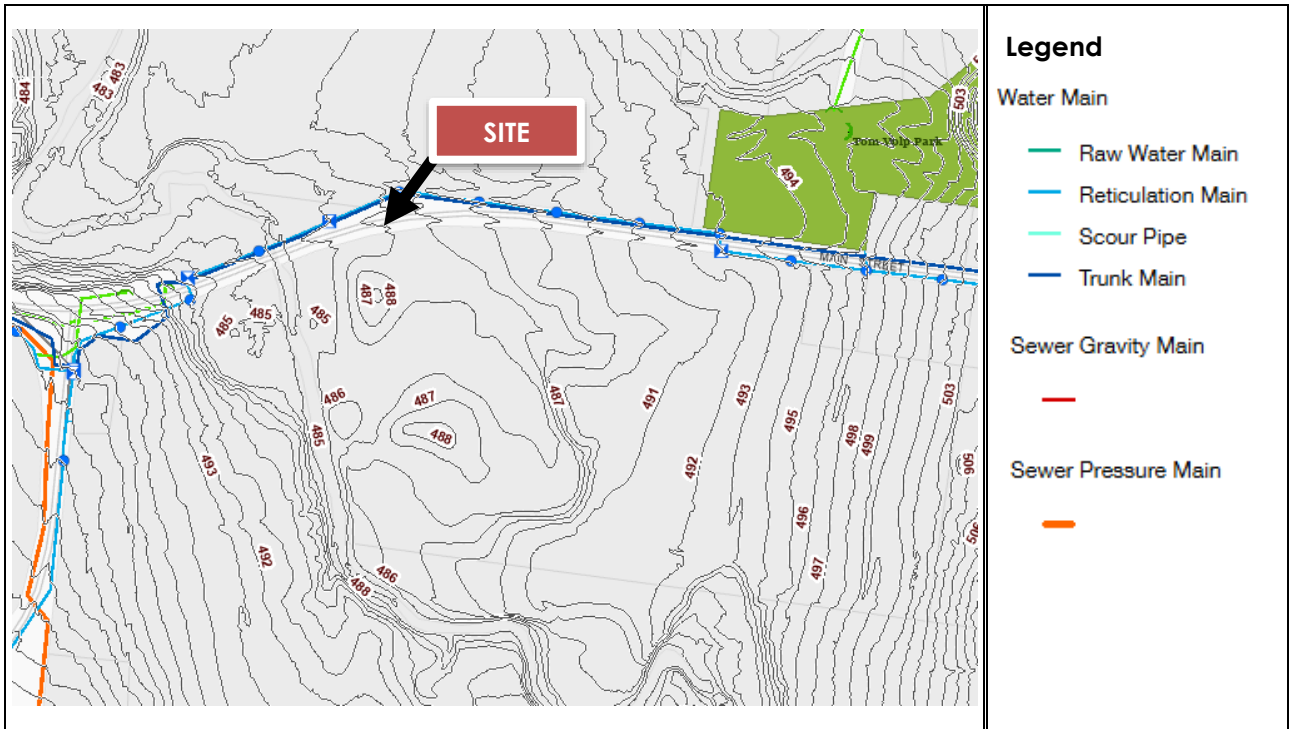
confirms that the site experiences a decline in land elevation between the northeast and southwest corners of the site. The figure also illustrates the locations of Council's reticulated water, sewerage and stormwater networks in relation to the site.
